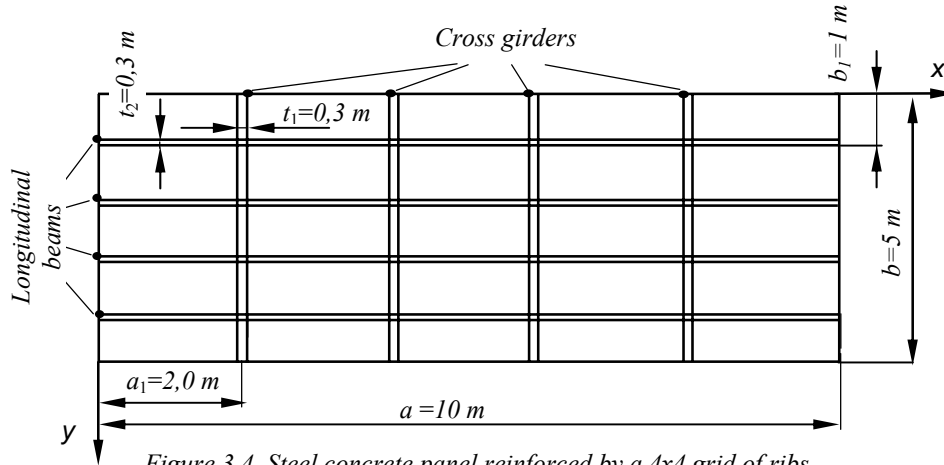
Steel concrete panel reinforced by a 4x4 grid of ribs
